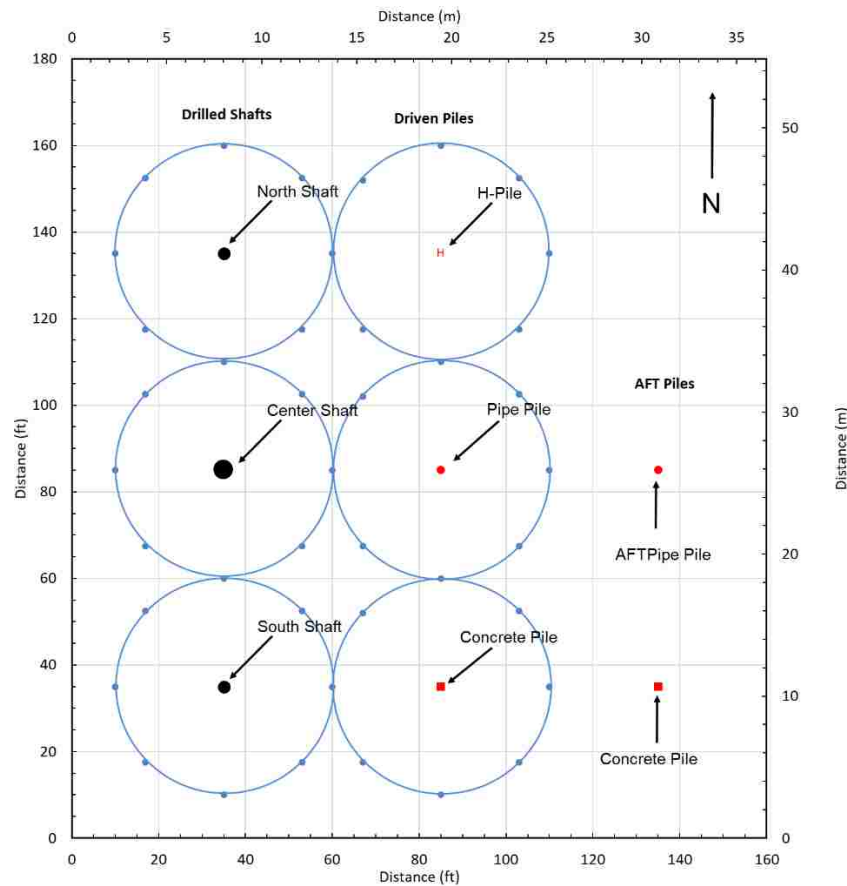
Plan view showing the overall layout of the blast rings, drilled shafts and driven piles.
